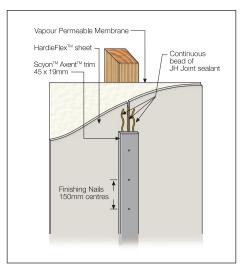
ABUTMENT HARDIEFLEX SHEET VERTICAL DETAIL
